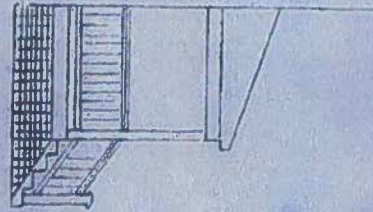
N. GRACE STREET, SUBMITTED PLANS
